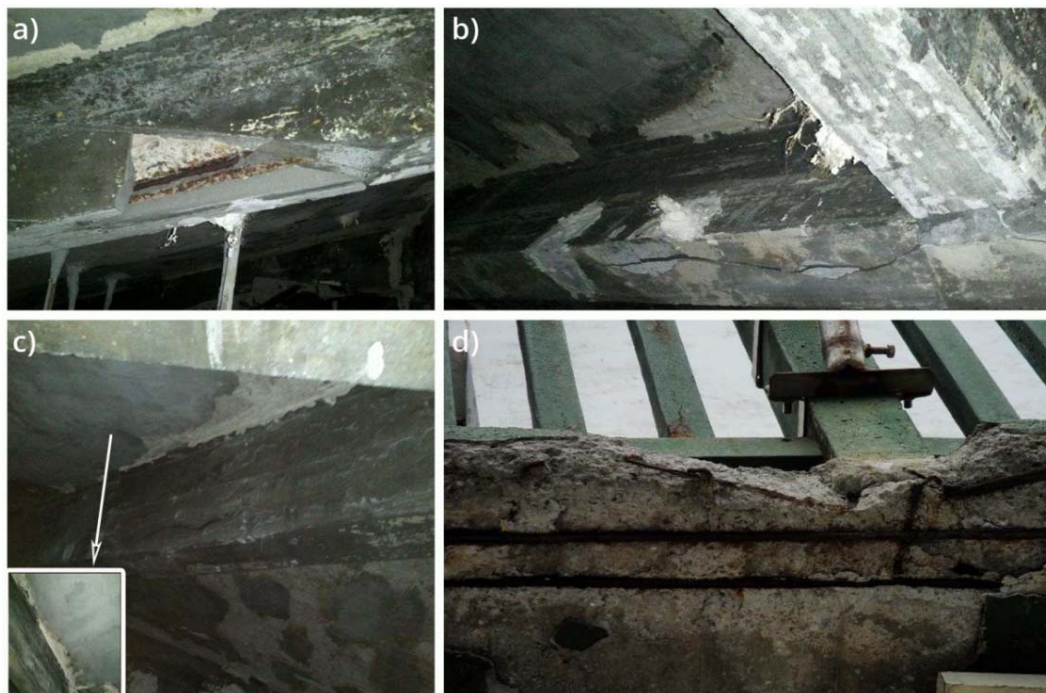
Selected photographs of the affections observed in the structures of Fishermen´s Association. a) Detachment of the roof structure, where the primitive concrete and the new concrete reinforcement can be observed. b) Cracking in the direction of the reinforced. c) The enlarged detail shows a reconstructed area based on layers of Portland cement mortar. d) The balcony structure completely exposed to the atmosphere.
